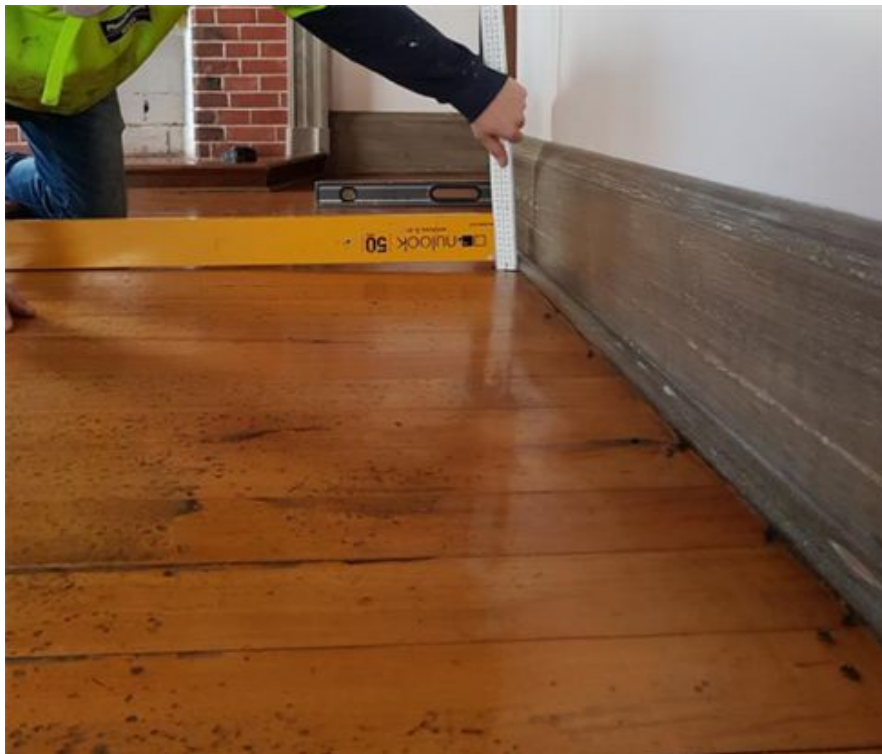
Displacement of Flooring Adjacent to Concrete Wall, Second Storey
